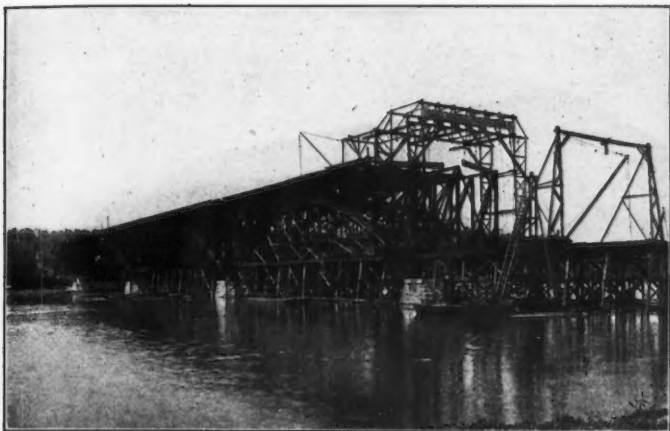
THE ERECTION OF THE FAIRMOUNT PARK BRIDGE, OVER THE SCHUYKILL RIVER, IN PHILADELPHIA.
